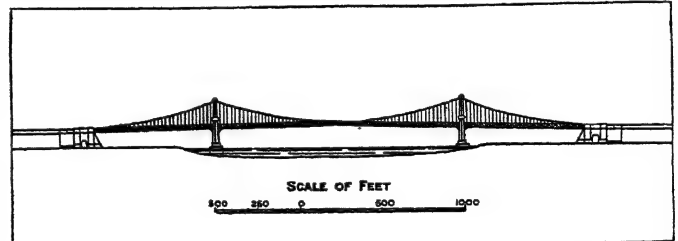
MAIN SUSPENSION SPAN, 1,470 FT. LONG, IN MANHATTAN BRIDGE, NEW YORK. EIGHT RAILWAY TRACKS, A ROADWAY, AND TWO FOOTPATHS ARE CARRIED BY THIS BRIDGE
